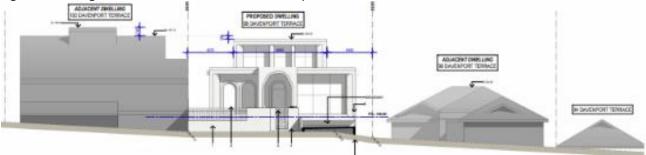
Showing the front elevation of the proposed dwelling (in the middle) in relation to its existing neighbours to the north and south.
